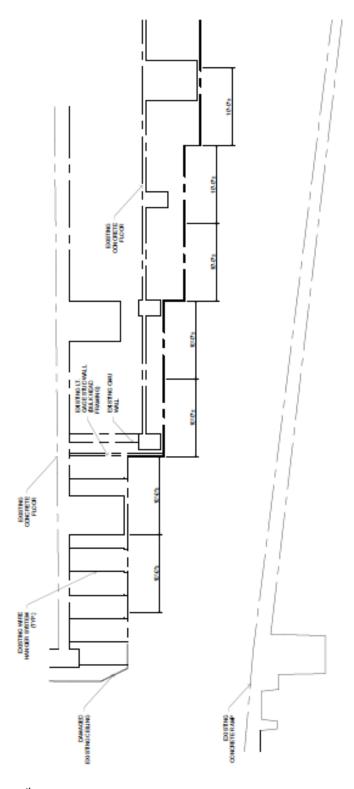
14th Street South Ramp cross section – Sketch for Existing Conditions
